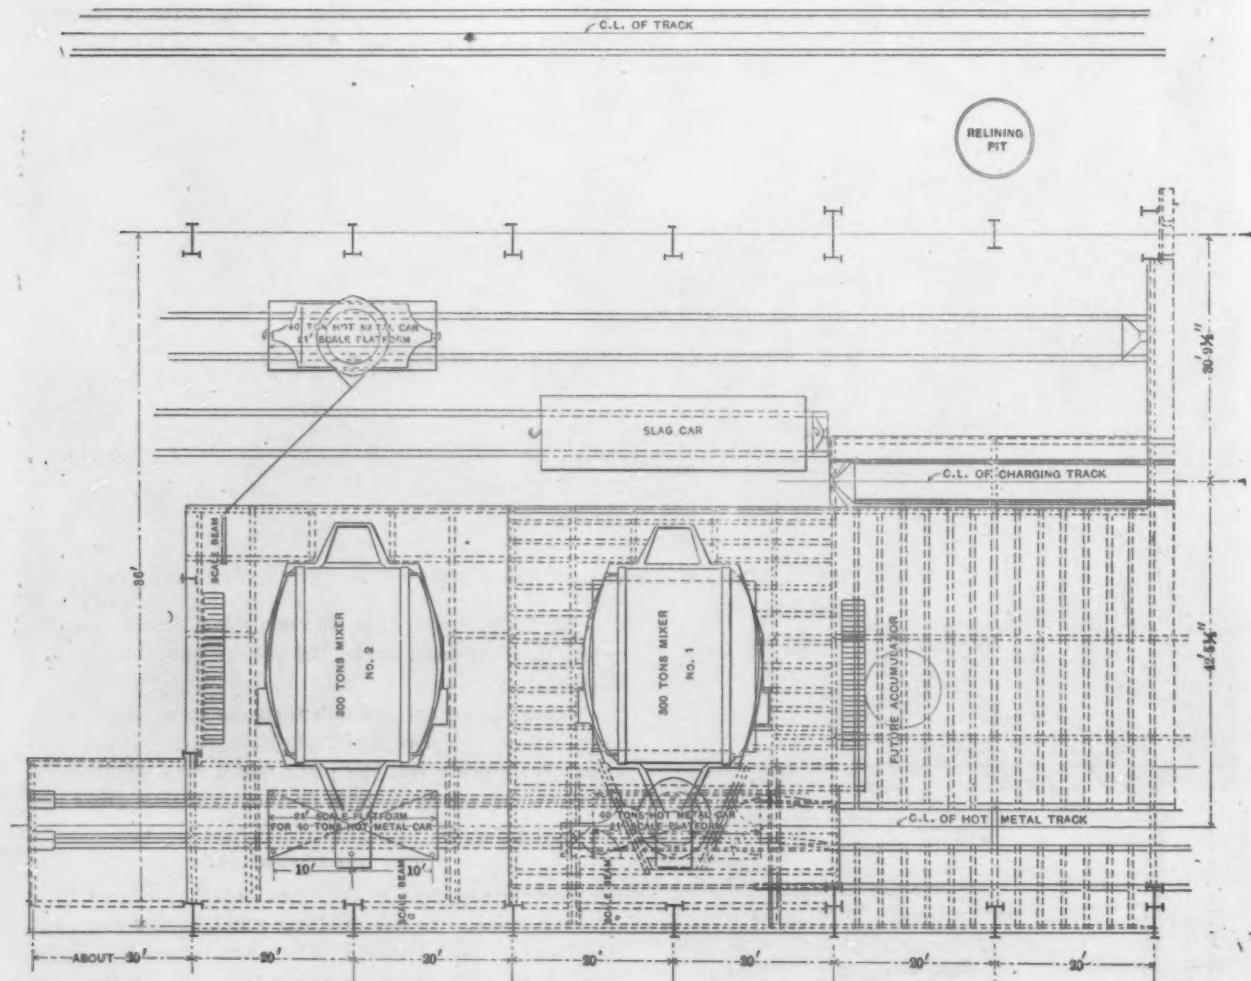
Plan of the General Arrangement of a Mixer Building.
